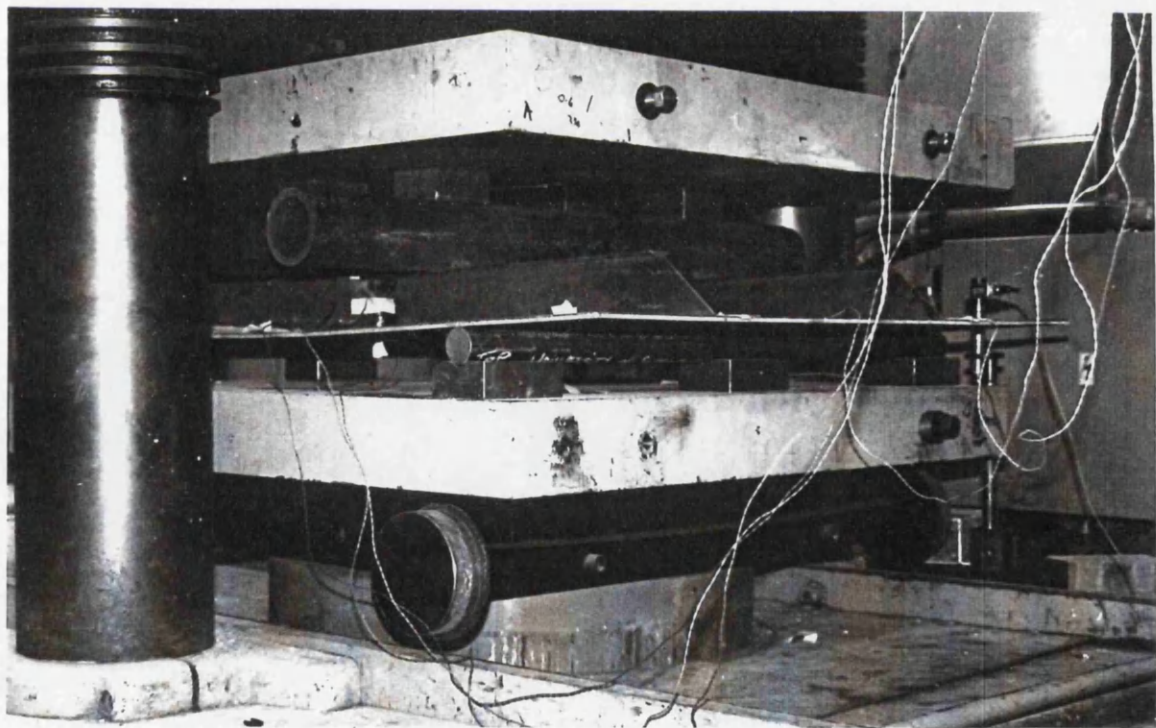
LARGE STEEL/STEEL PANEL DURING TESTING
